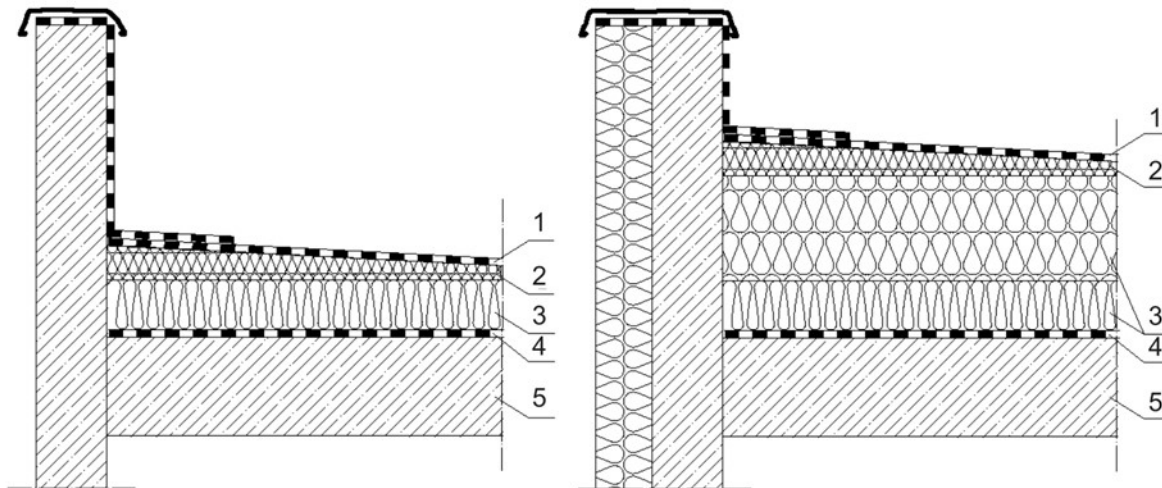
Retrofitting a solid flat roof: 1 – top protective layer, 2 – sloping layer, 3 – thermal insulation, 4 – vapour-proofing, 5 – ceiling
